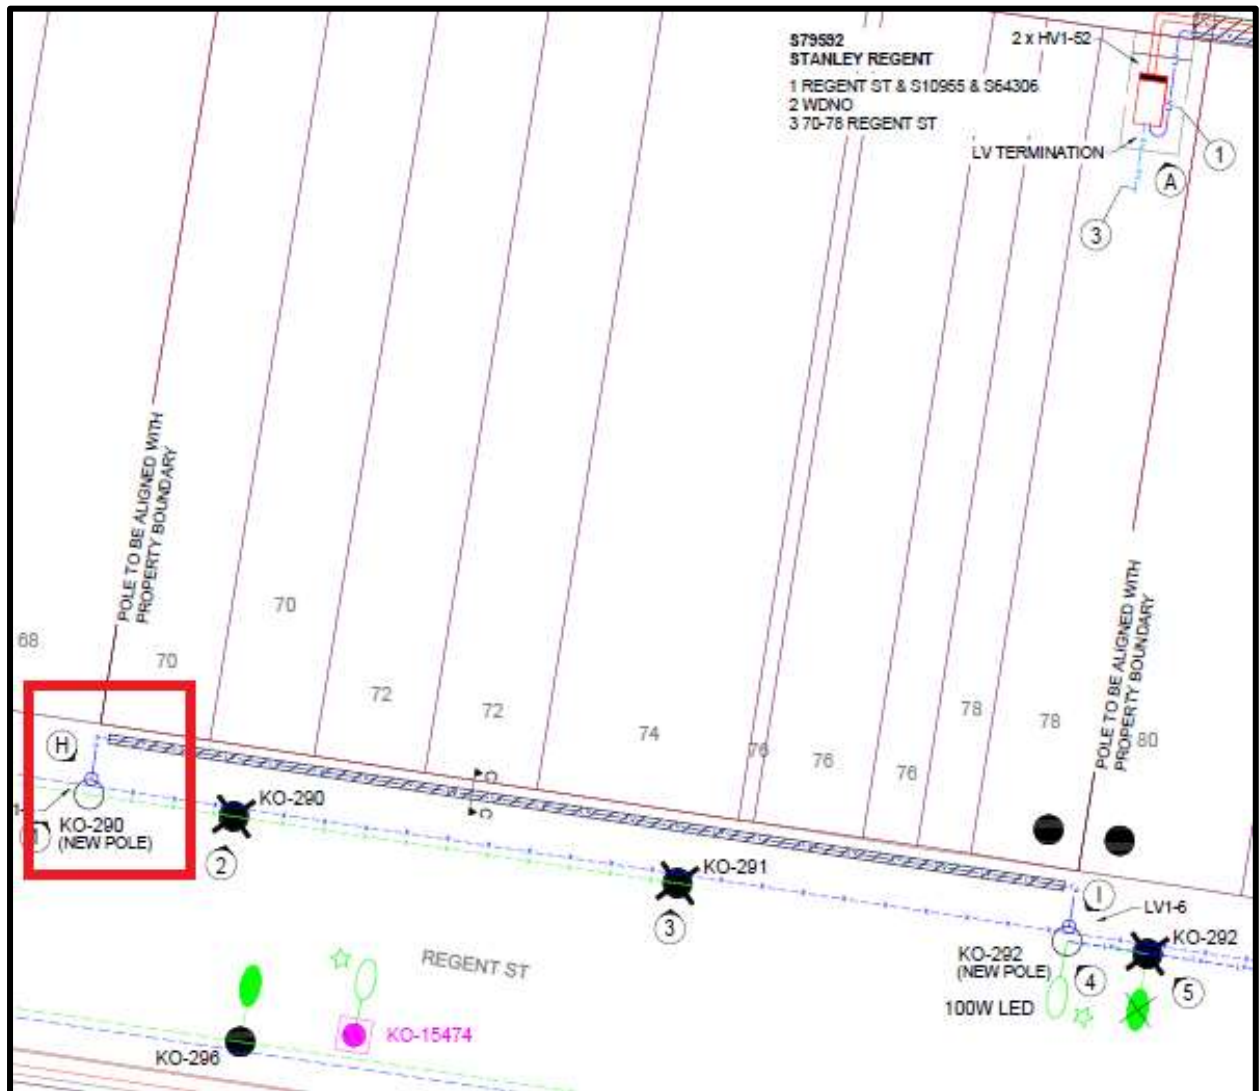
New pole (outlined in red) as per Electricity Cabling Design Layout Plan (Source: AA Power Engineering)
